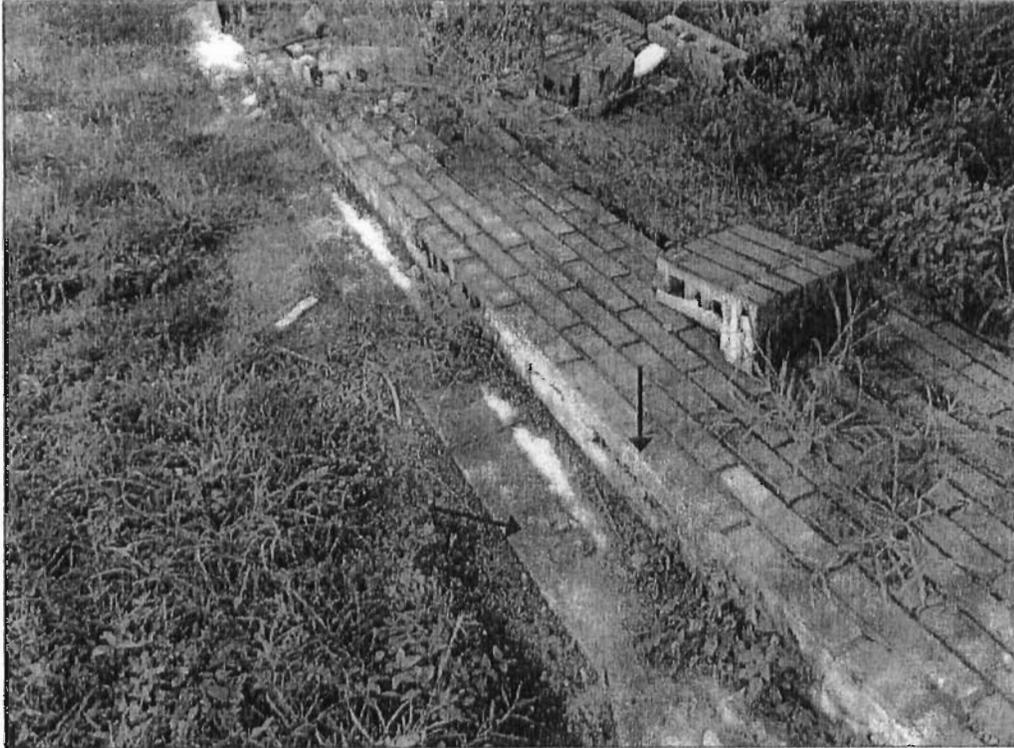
Collapsed section of privacy wall where base course of masonry (right arrow) separated from concrete footing (left arrow).
